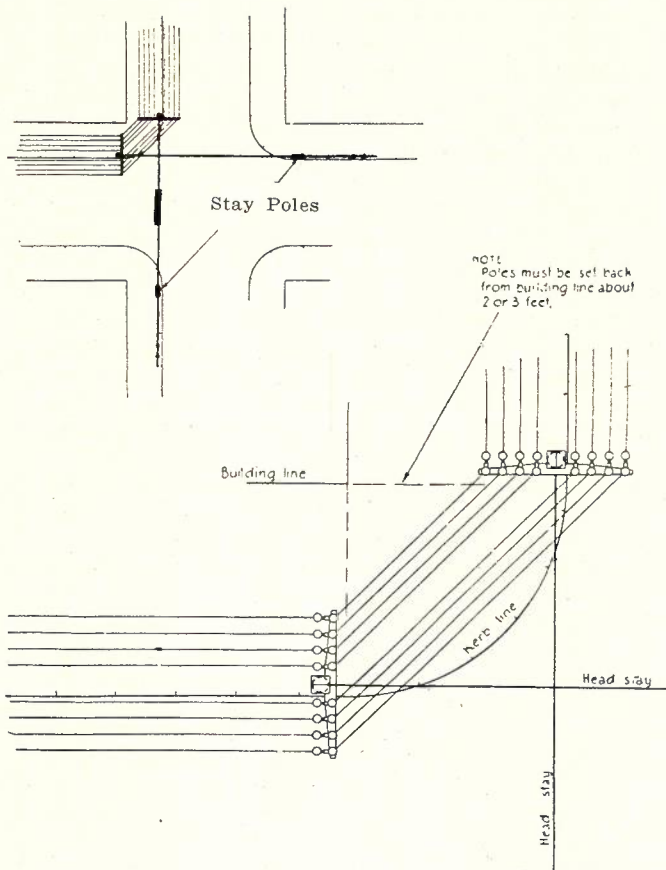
Turning Street Corners—Wires Terminated at Poles.
